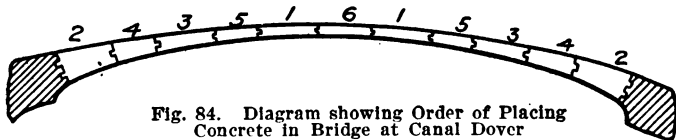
Diagram showing Order of Placing Concrete in Bridge at Canal Dover
